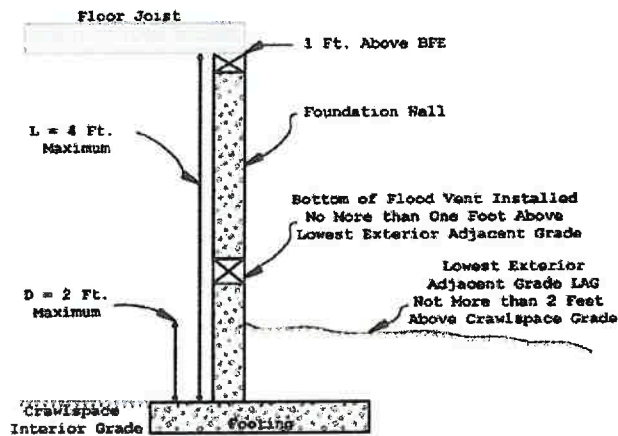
BELOW-GRADE CRAWLSPACE CONSTRUCTION
